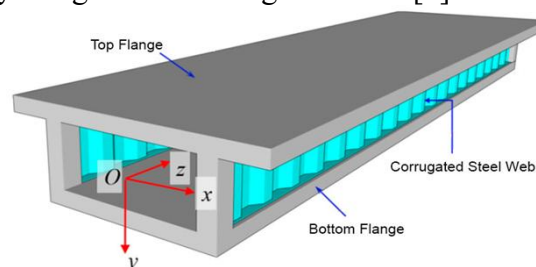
Structural diagram of a PC composite box girder with corrugated steel webs.
